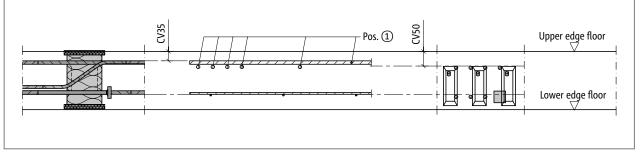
Schöck Isokorb® XT type C: On-site reinforcement outer corner balcony (section XT type C-L-CV35, view XT type C-R-CV50)
